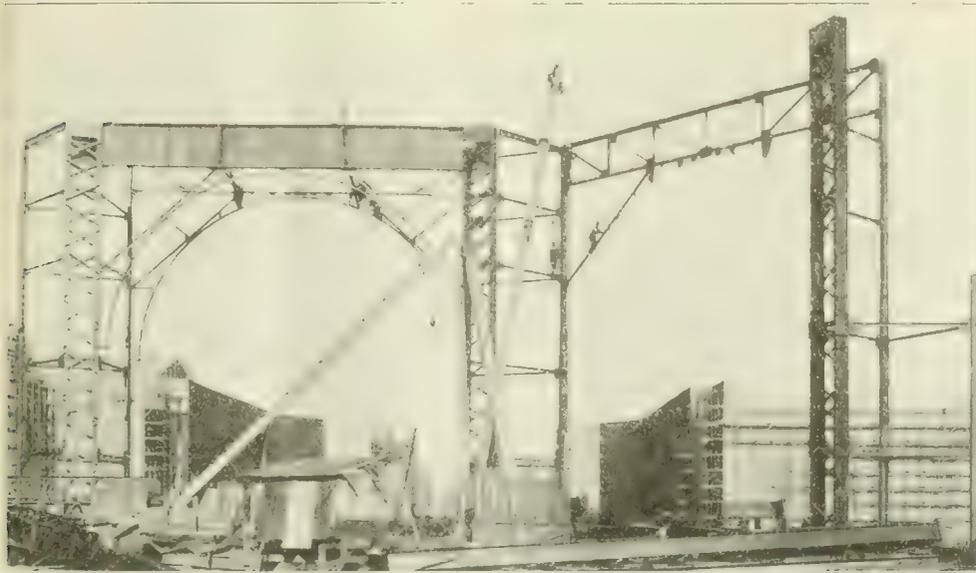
View Showing Manner of Erecting Dome Piers and Supporting Girders of Same of Palace of Horticulture.
